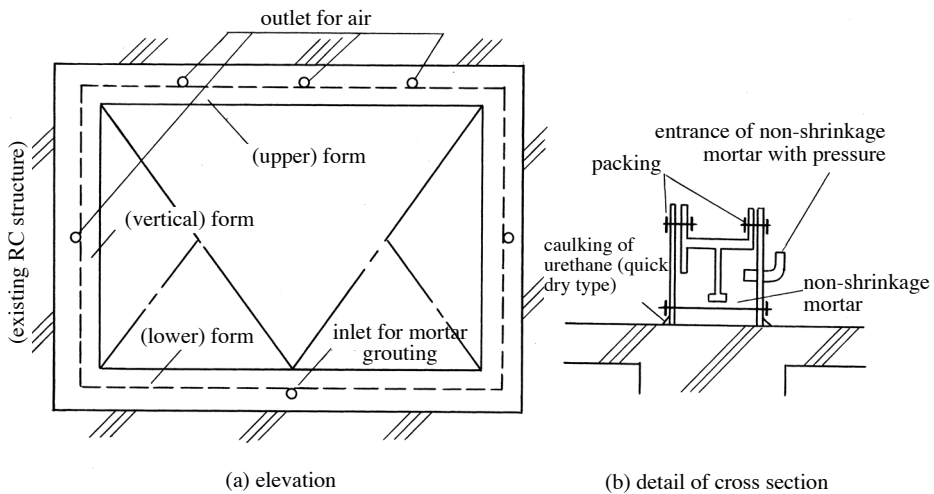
Grouting method of non-shrinkage mortar with pressure
